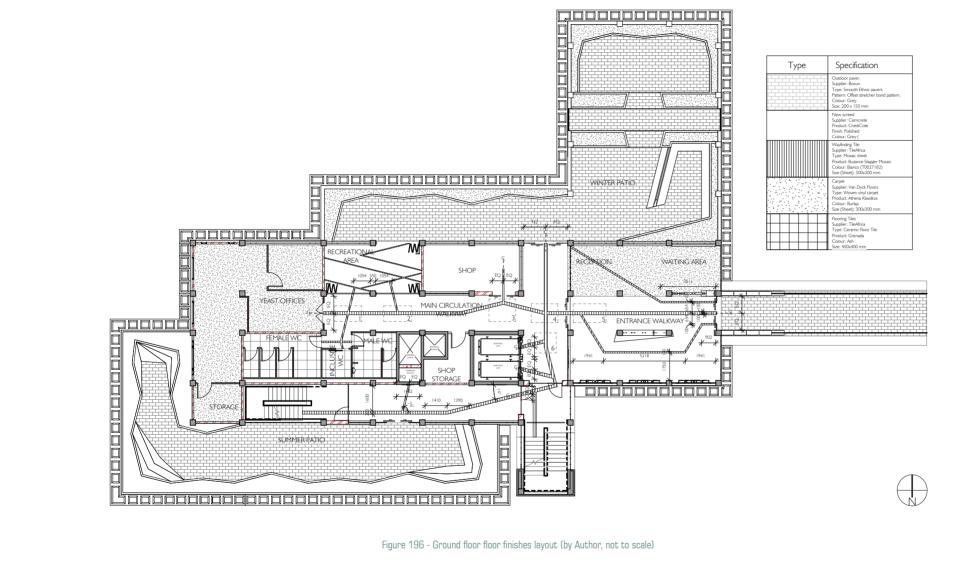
Ground floor floor finishes layout (by Author, not to scale)
